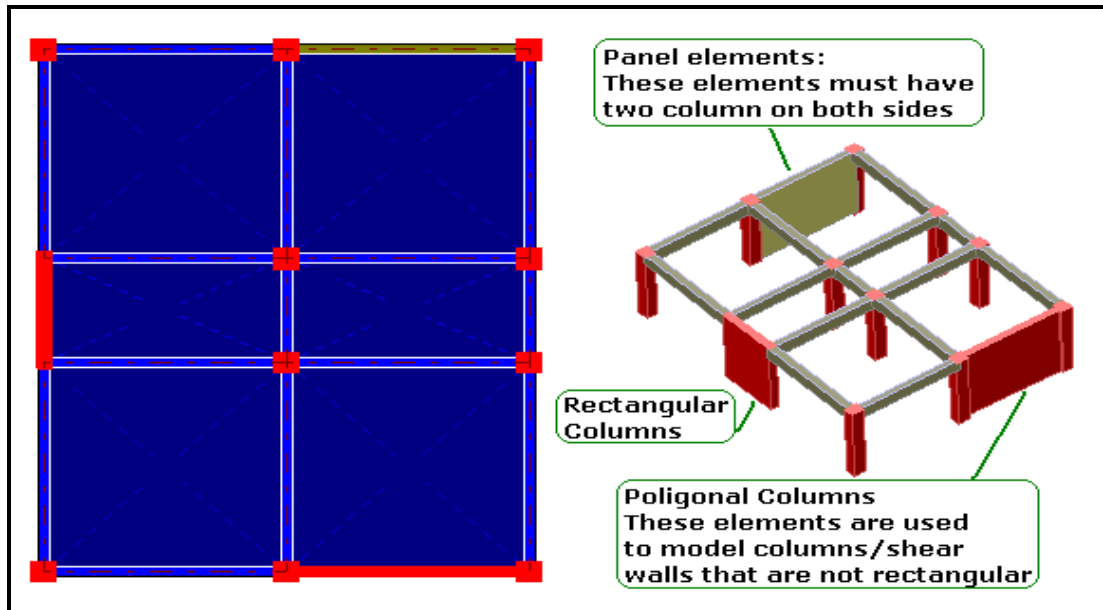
Types of Shear Wall (STA4-CAD Handbook)
